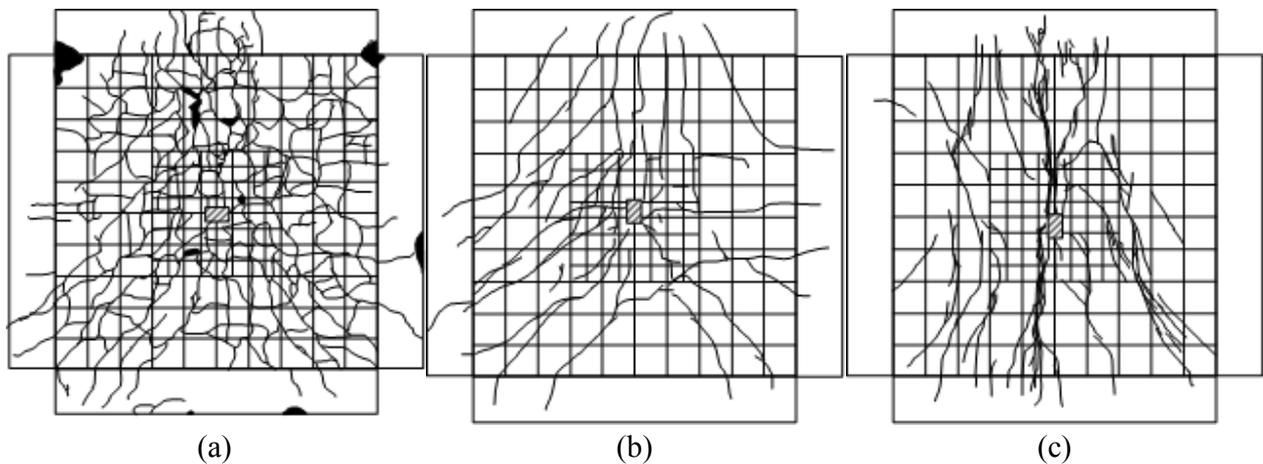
Bottom surface crack patterns of blasted specimens: (a) NSC (b) UHSC (c) RPC
